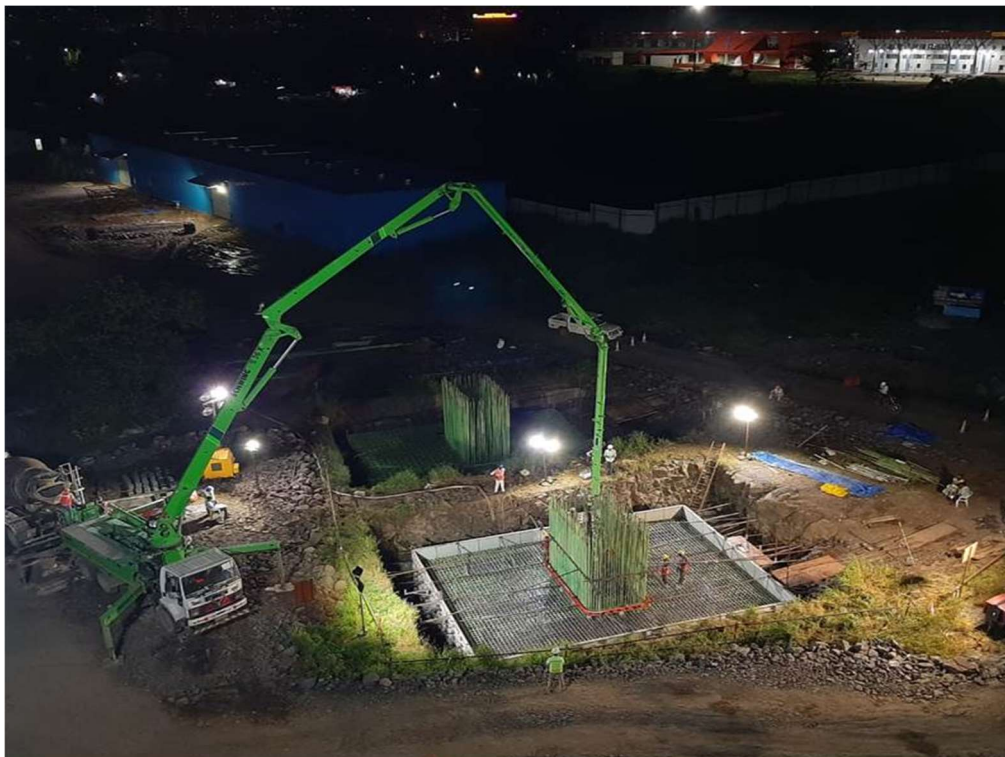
Open Foundation Concreting at MP 264 RHS in progress
